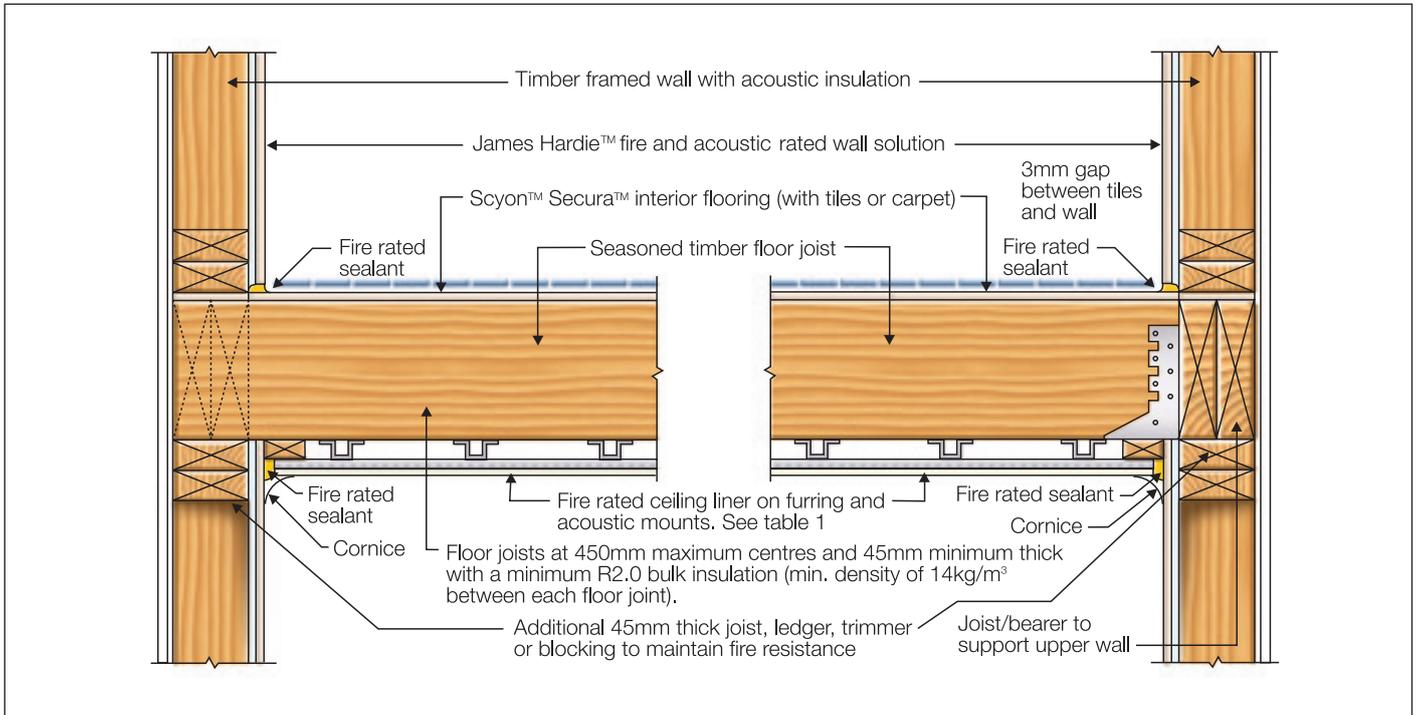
FLOOR TO WALL JUNCTION - OPTIONS 1 & 2
